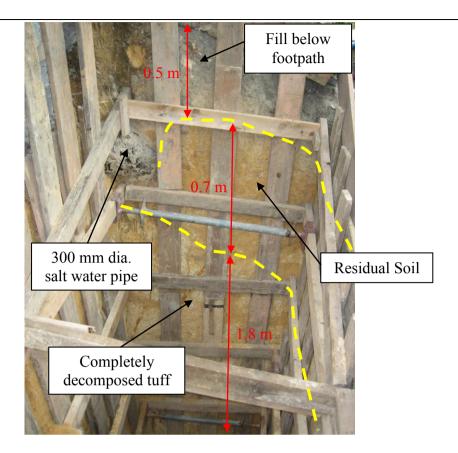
Trial Trench TTH2 adjacent to the Staircase Leading to Footpath FP3, Showing the Salt Water Pipe Overlying RS and CDT (Photograph taken on 23 September 2008)
